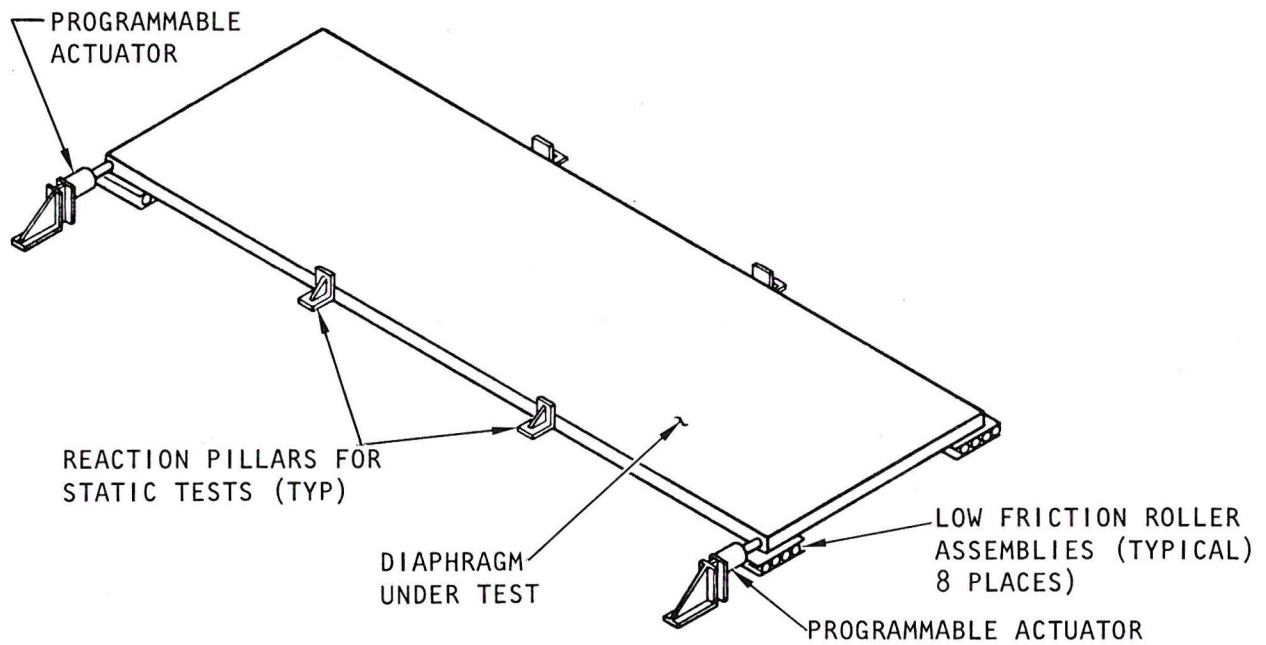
TEST SETUP FOR QUASI-STATIC TESTING OF DIAPHRAGMS
